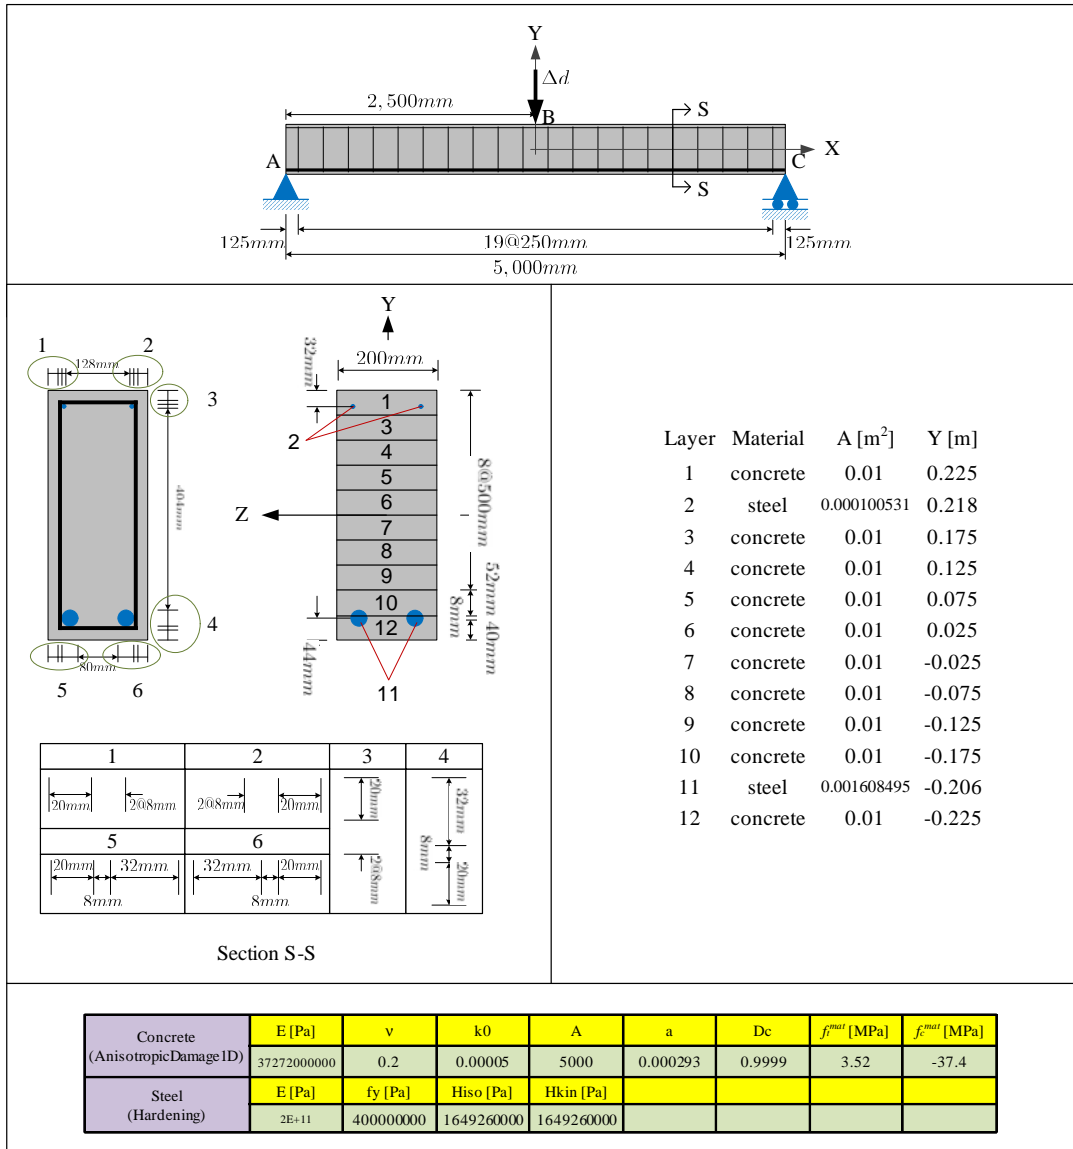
Example 2: Beam with layer sections, and anisotropic 1D damage and hardening material
